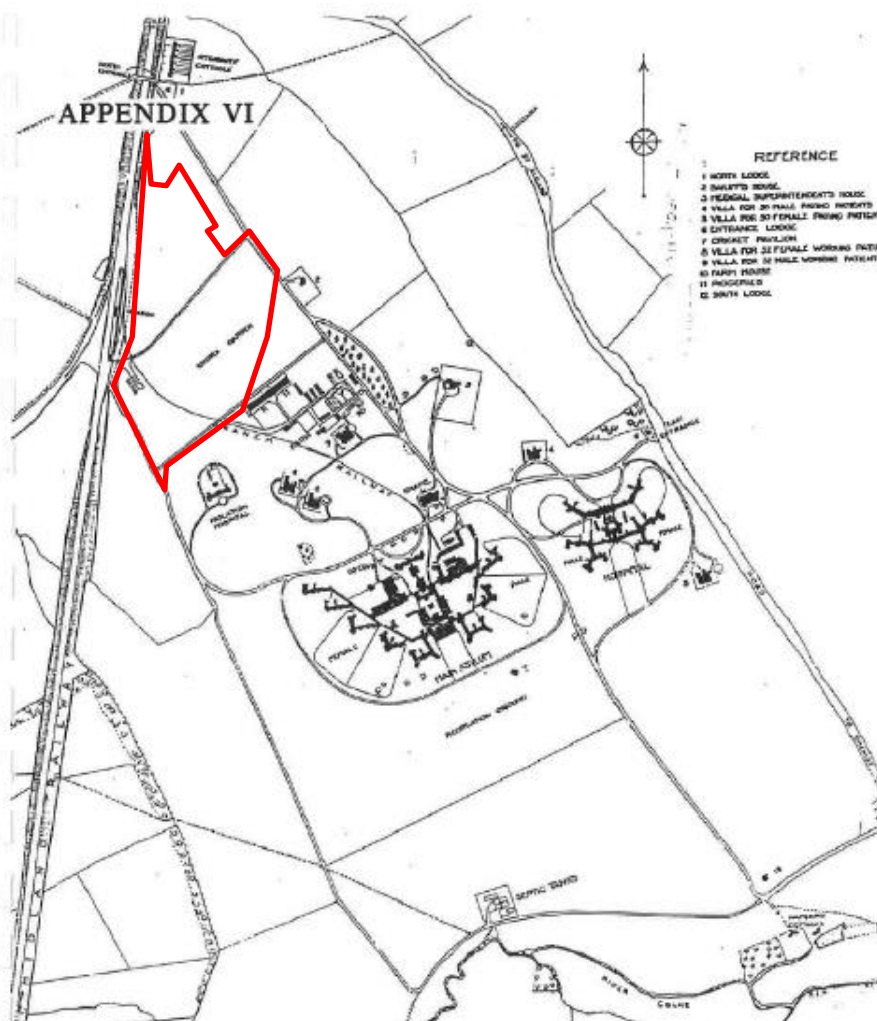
Layout of the Hospital buildings with the approximate site area indicated.
